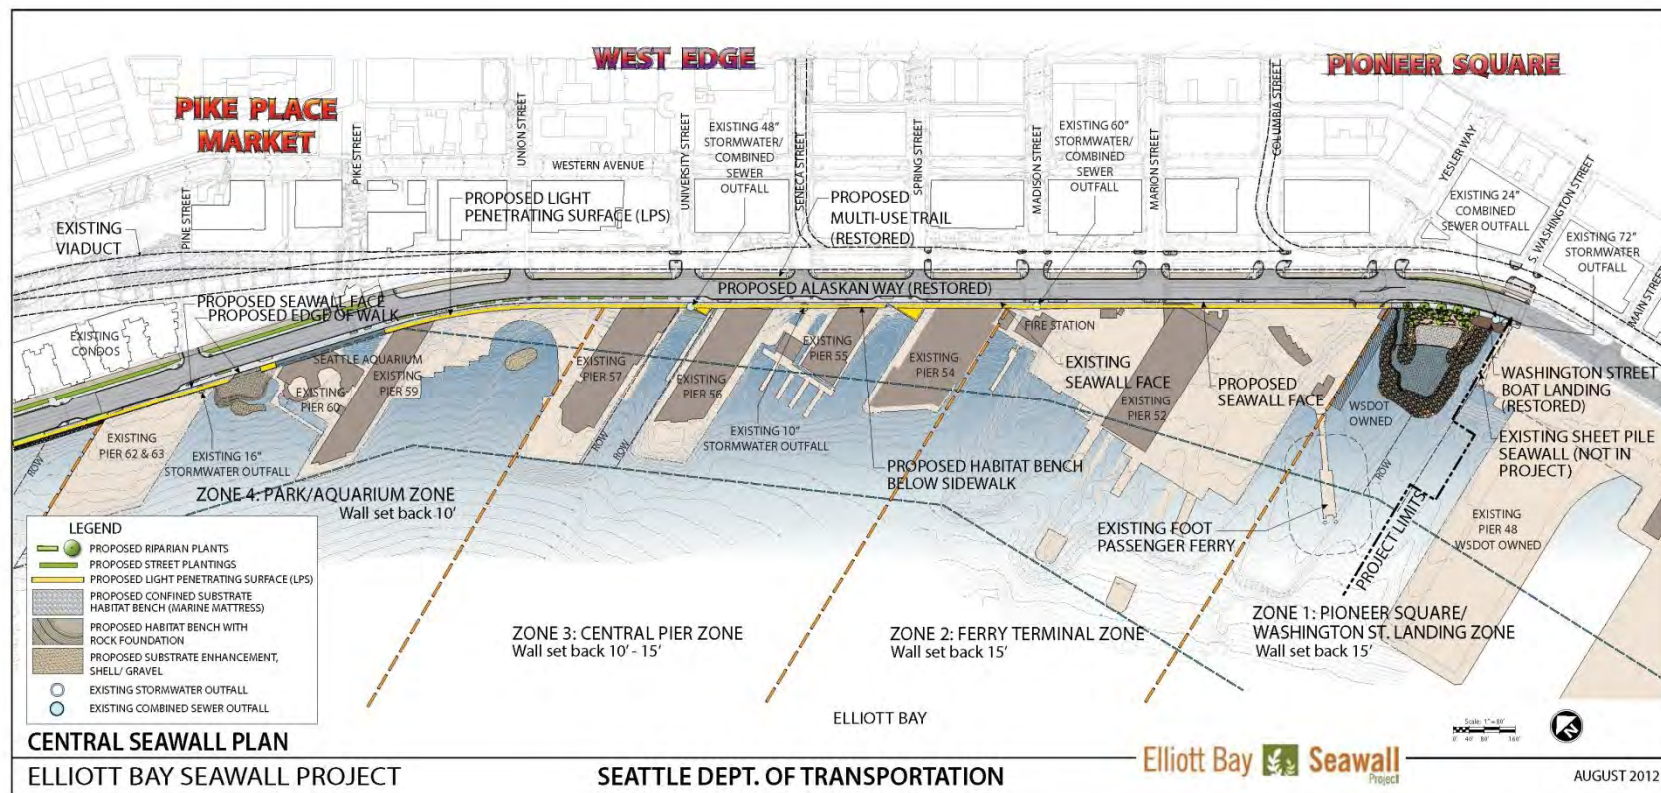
Proposed Elliott Bay Seawall Project Plan View, Central Seawall
